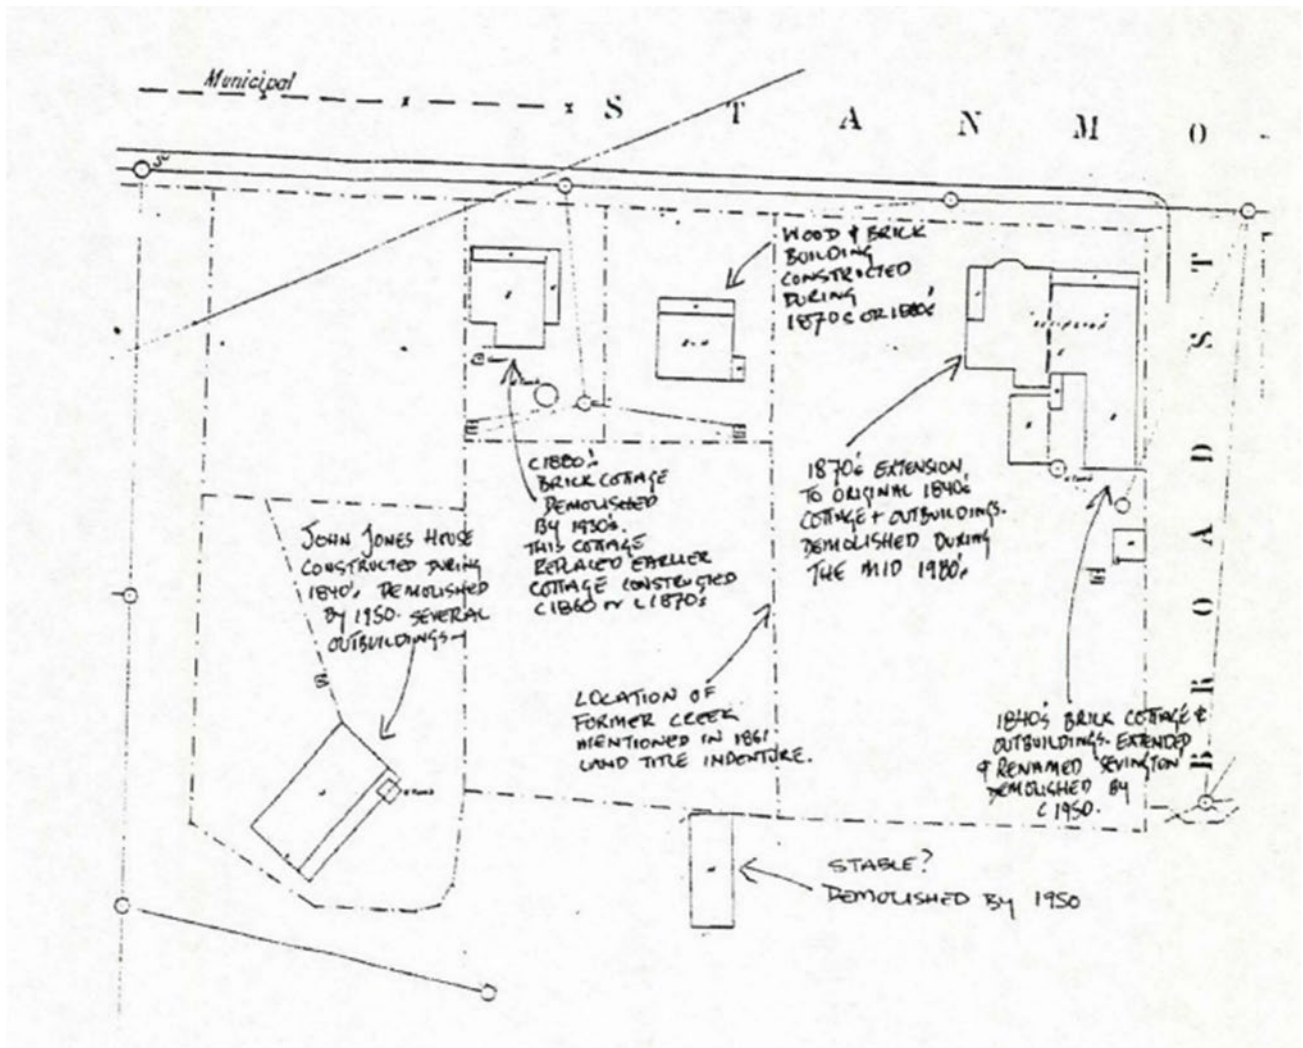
Plan of the former structures located along the Newington Rd Frontage of the Subject Site dating to c1890.
